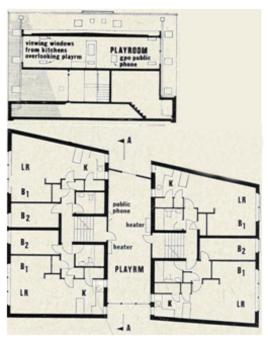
Fiona House. Section and plan of the apartment building. Red annotations added by author.
